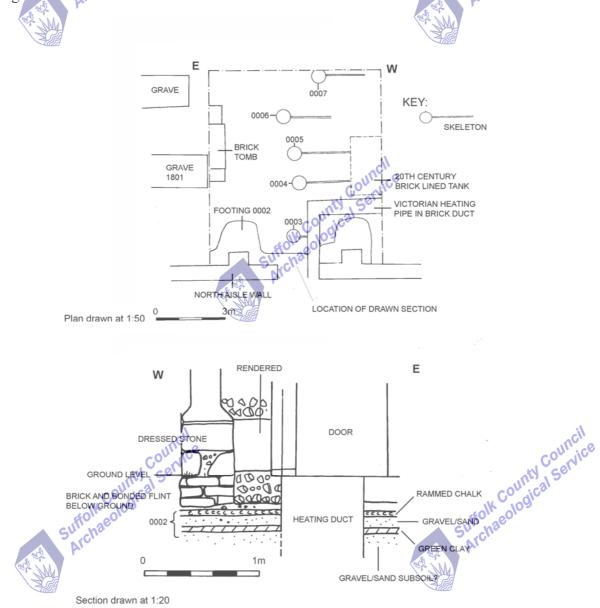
Plan of stripped area and section showing north aisle wall footing.
